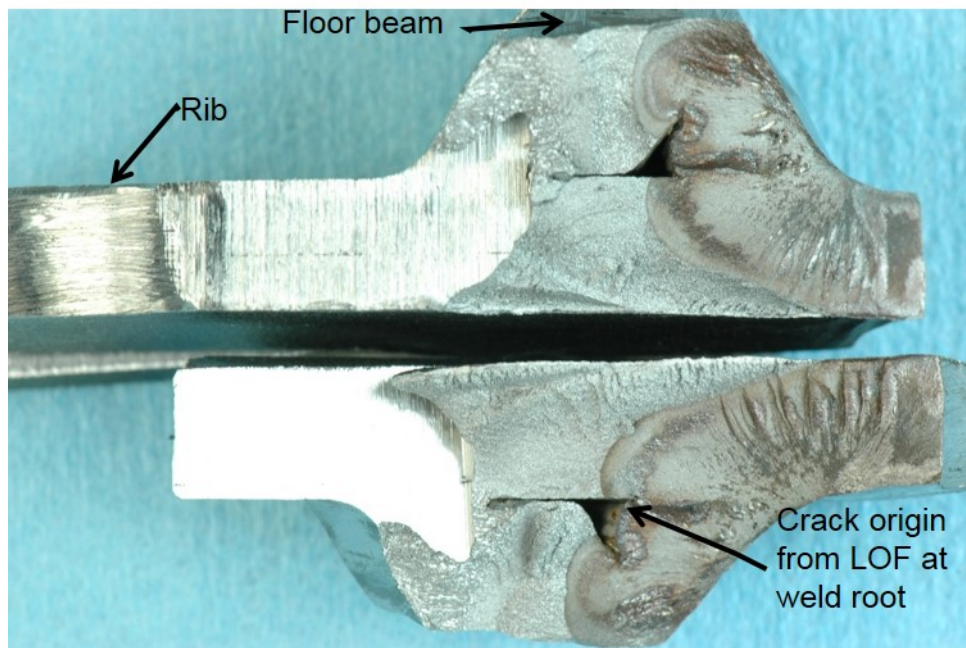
Mating fatigue fracture surfaces for the crack to the south of rib at 35 degrees from rib soffit in MU3
